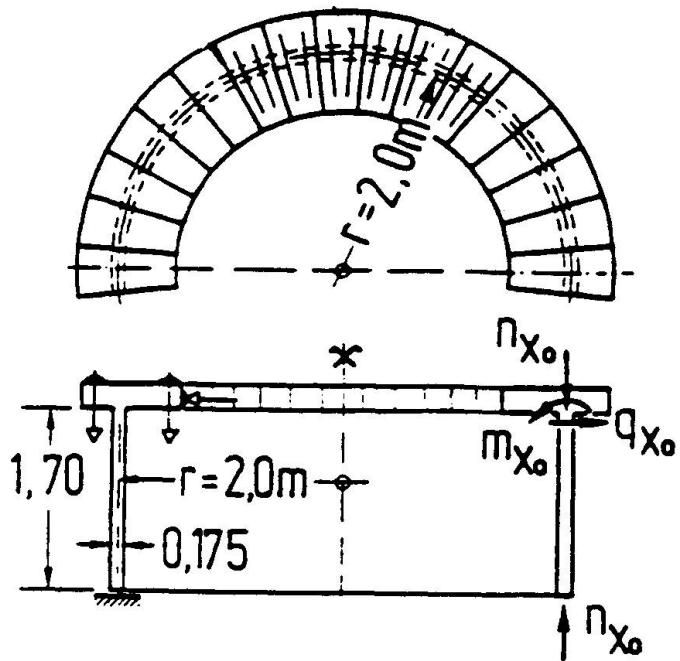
CYLINDRICAL SHELL SPECIMEN FOR UNIT FORCES
